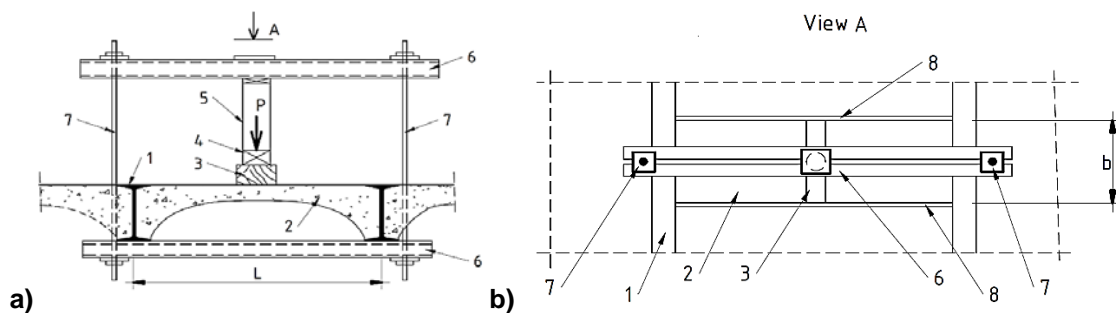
Test bench: 1 – steel beams, 2 – Prussian vault with brick aggregate concrete, 3 – spacer, 4 – dynamometer, 5 – hydraulic actuator, 6 – cross-arm, 7 – steel cables, 8 – cutting joint
